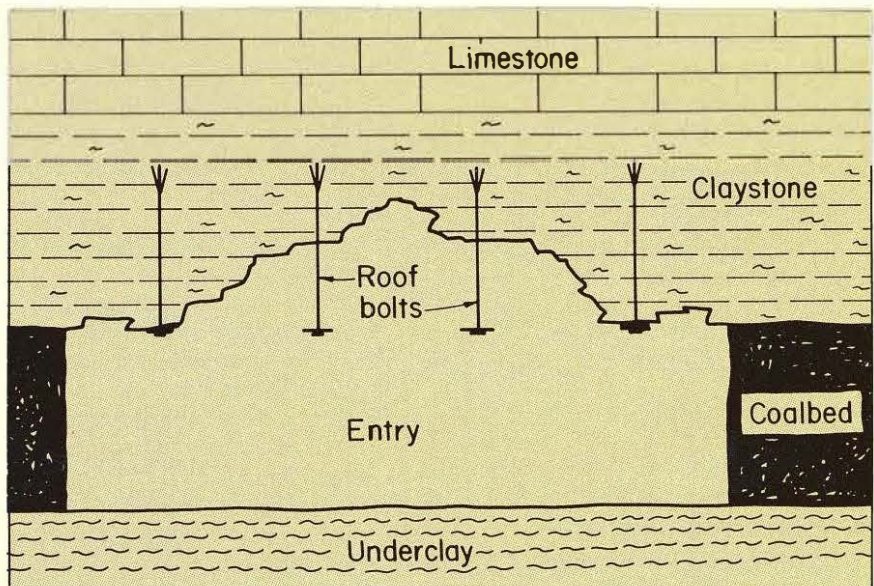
Subtype G_2 roof failure attributed to moisture sensitive roof rock.
